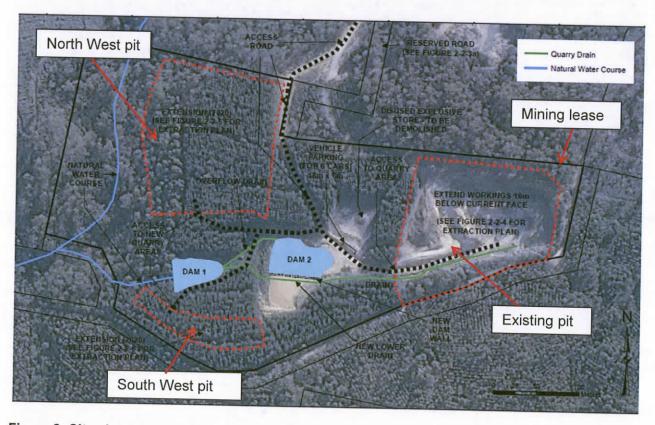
Site plan (Figure 2-2-3b of the DPEMP).
